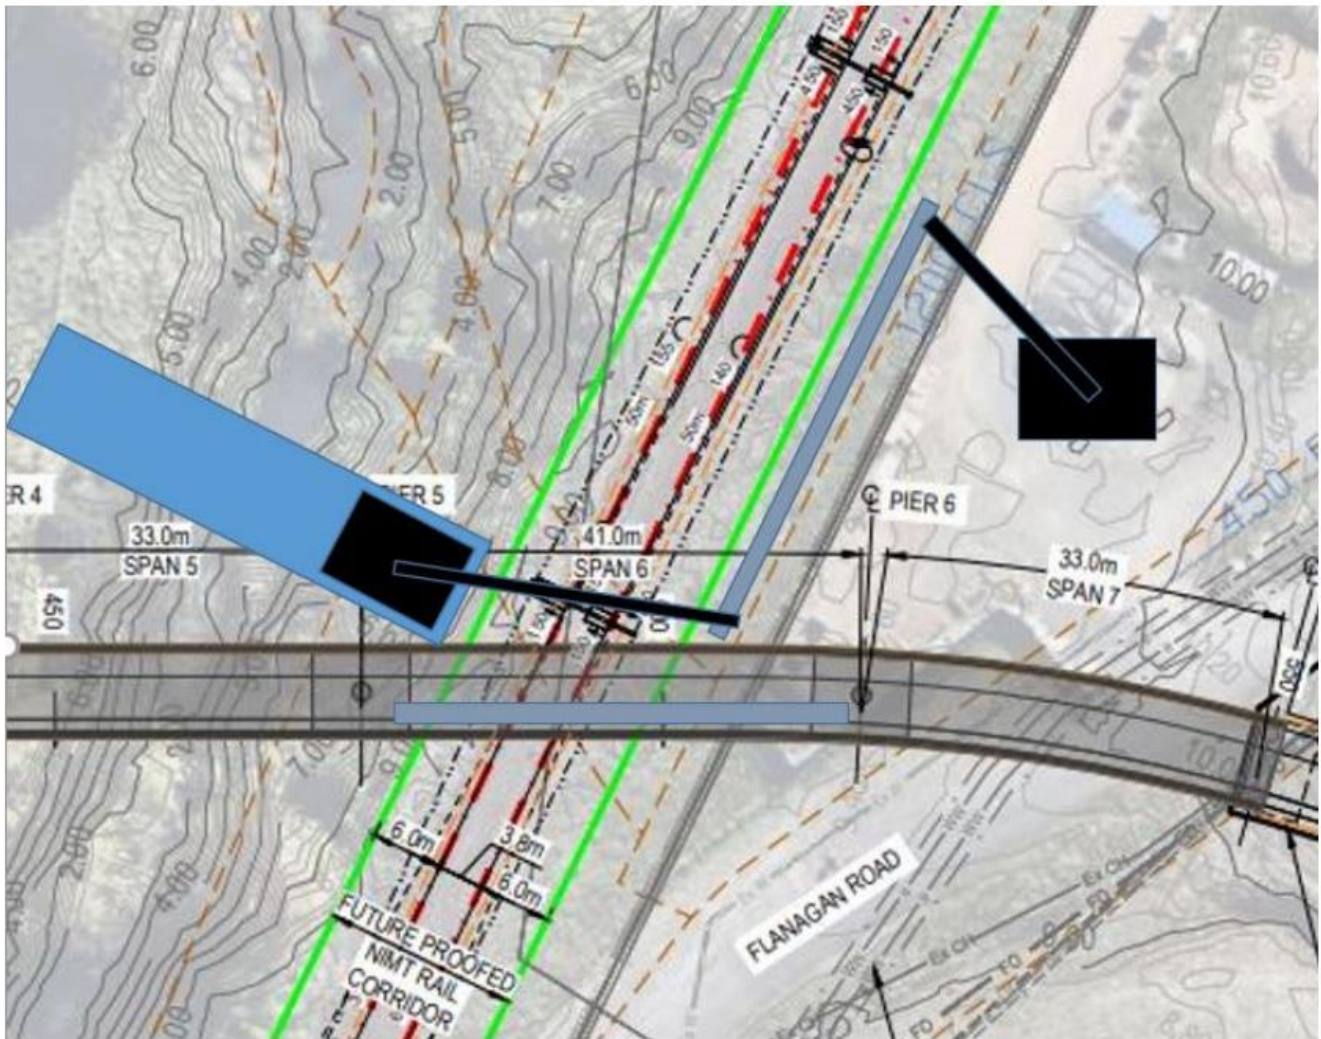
The tandem lift for beams between Pier 5 and Pier 6
